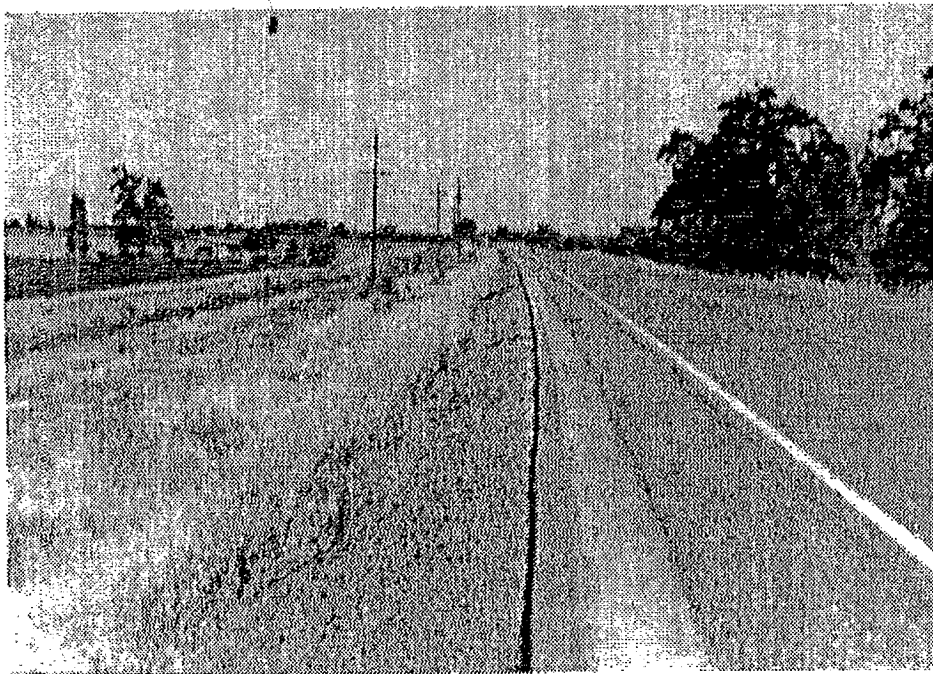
Site 16 - Paved highway on top of levee and an irrigation ditch running parallel to the landside toe throughout this site. (May 21, 1992)
